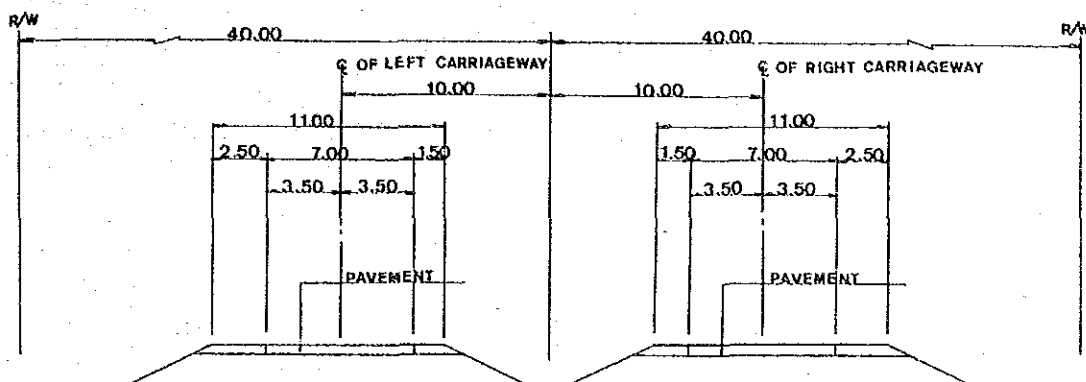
TYPICAL CROSS SECTION OF DIVIDED PRIMARY HIGHWAY
